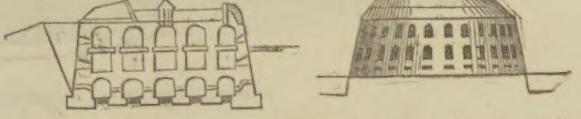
CIRCULAR REDOUTS AT LINTZ, SECTION AND ELEVATION.
